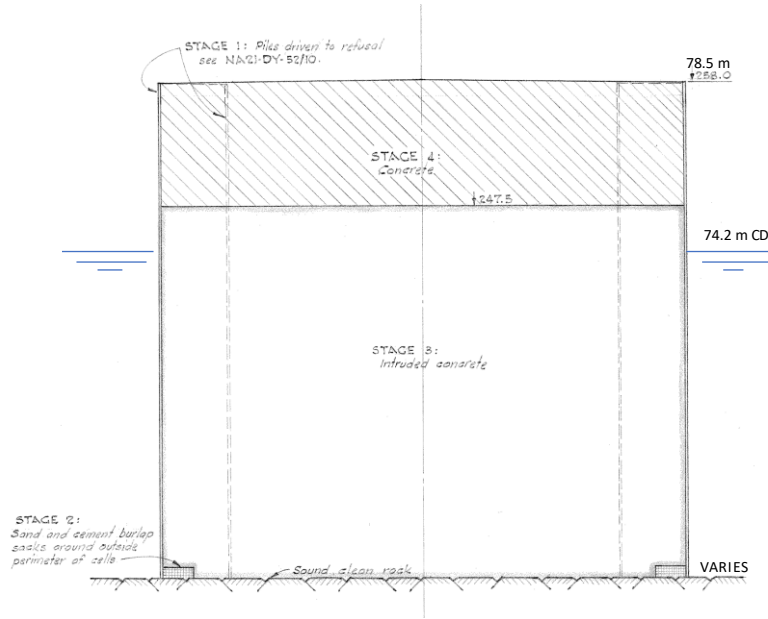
Typical cross-section of outer portion of Western Pier (cellular steel sheet pile, intruded concrete fill and concrete cap)
